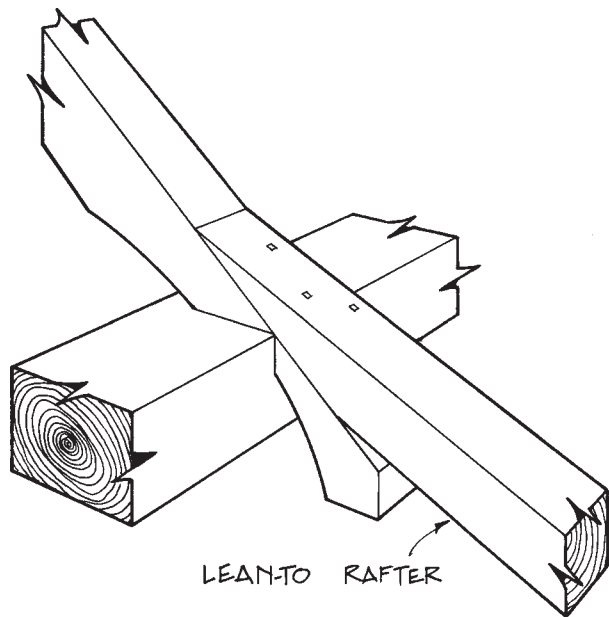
Dutch houses often had "broken back" lean-tos, where the lean-to pitch was lower than the main roof pitch. A simple, effective solution was to bear the lean-to rafter on the back of the main rafters and secure the connection with a pin or nails.
